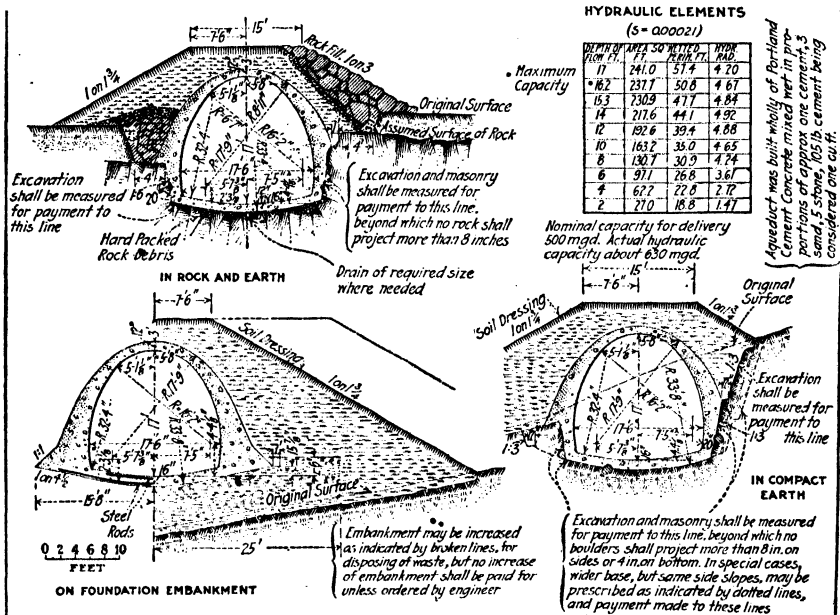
Catskill aqueduct. Standard types, open cut and embankment.
